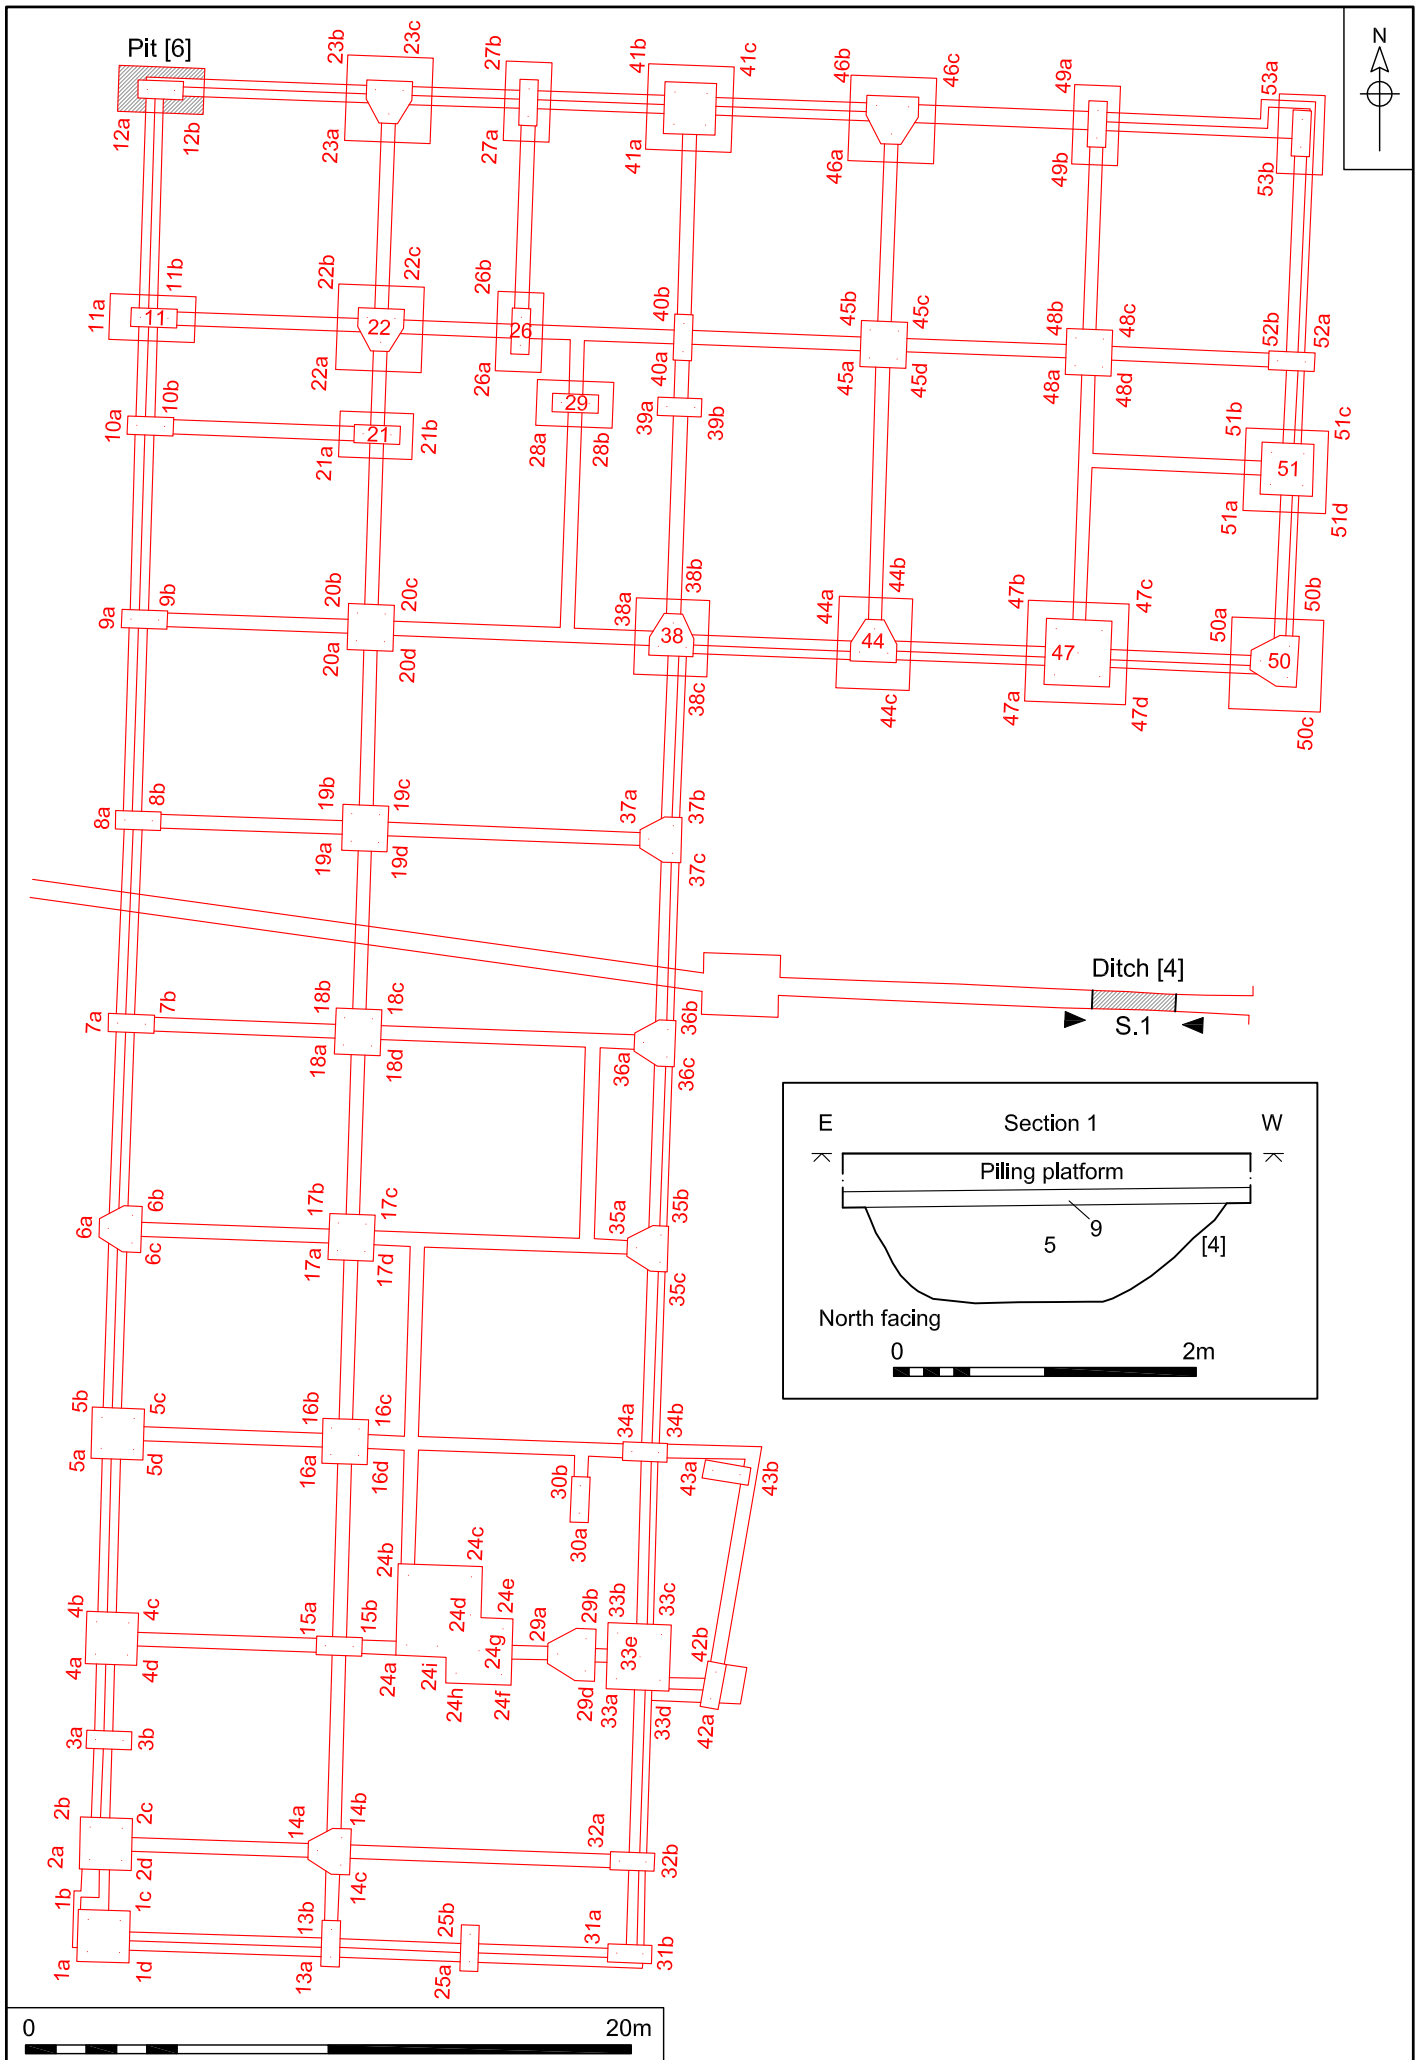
Piling plan. Scale 1:250. Inset of section 1 at 1:50
